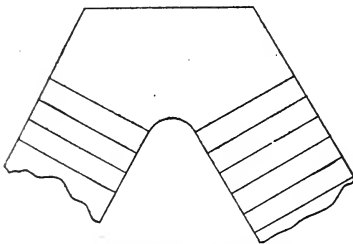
Plan of Stair with Acute-Angle Landing and Cylinder.
